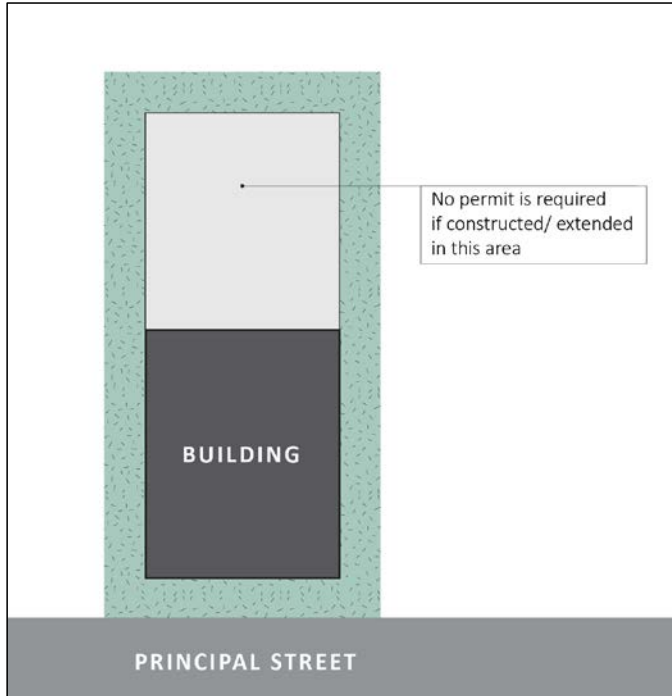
Construction of a single-storey addition or extension to an existing building is exempt if located in this area
